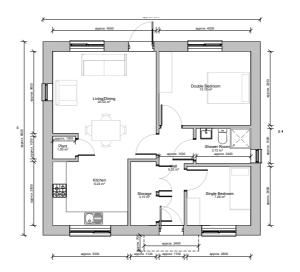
2-Bed Unit Ground Floor (not to scale)
